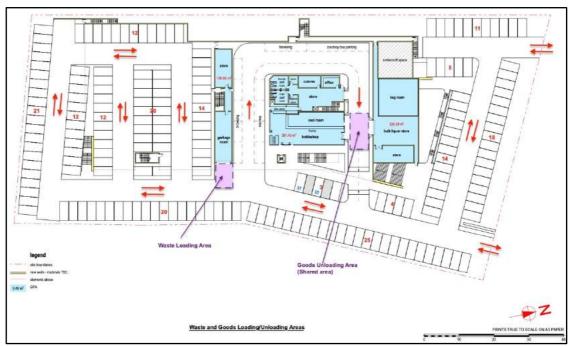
Waste & Goods Loading/Unloading (Source: SP/DMD 2023)
